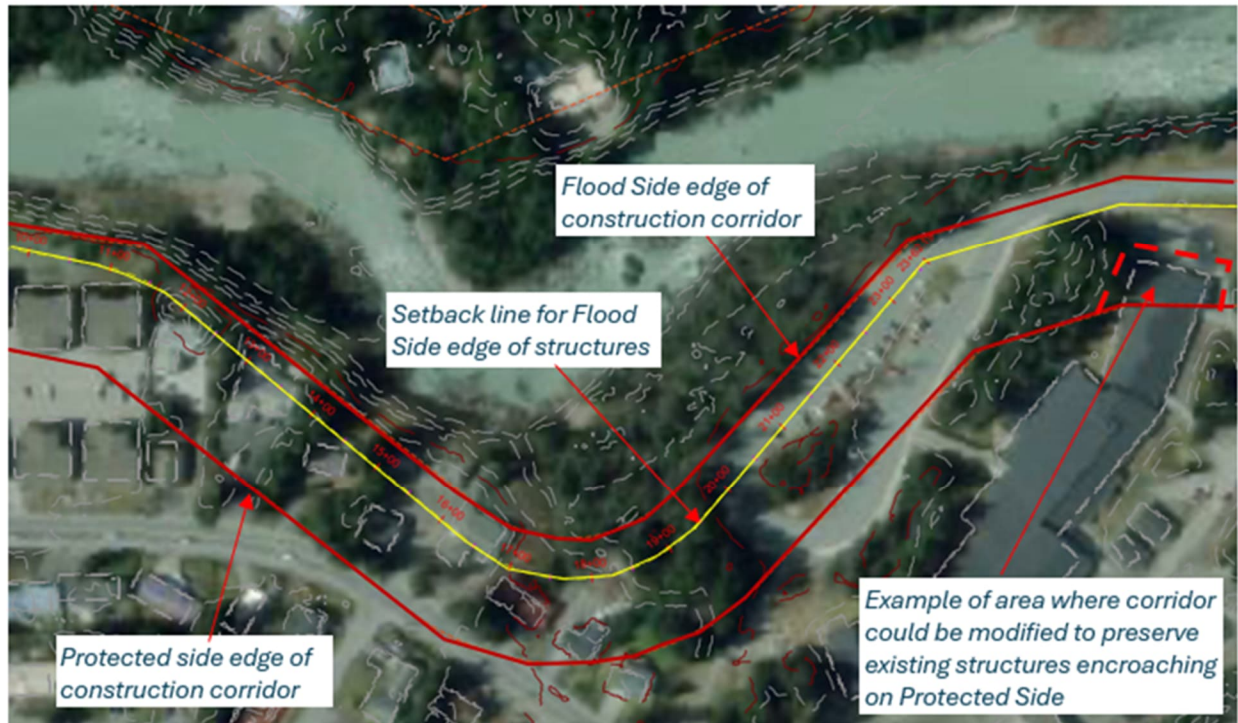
Example Floodwall Alignment (Neighborhood South of the Mendenhall Loop Bridge Shown) with 150-Foot Construction Corridor
